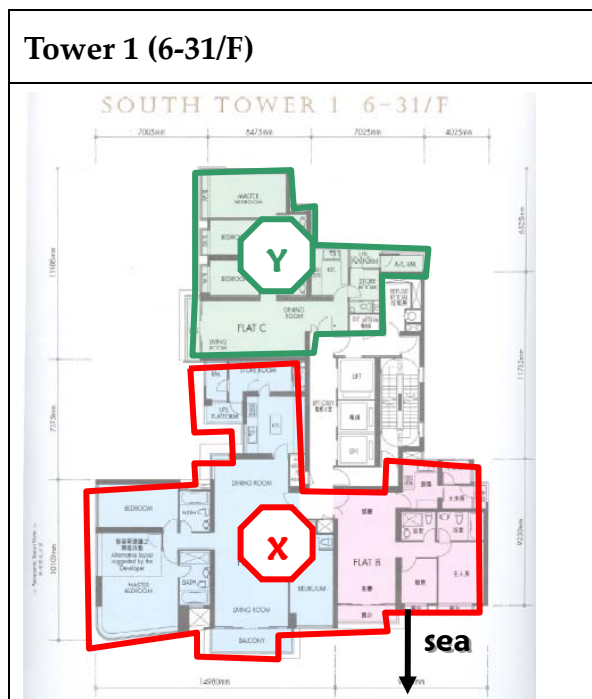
Floor plan of South Towers Residence Bel-air (Source: Centamap 2007)
